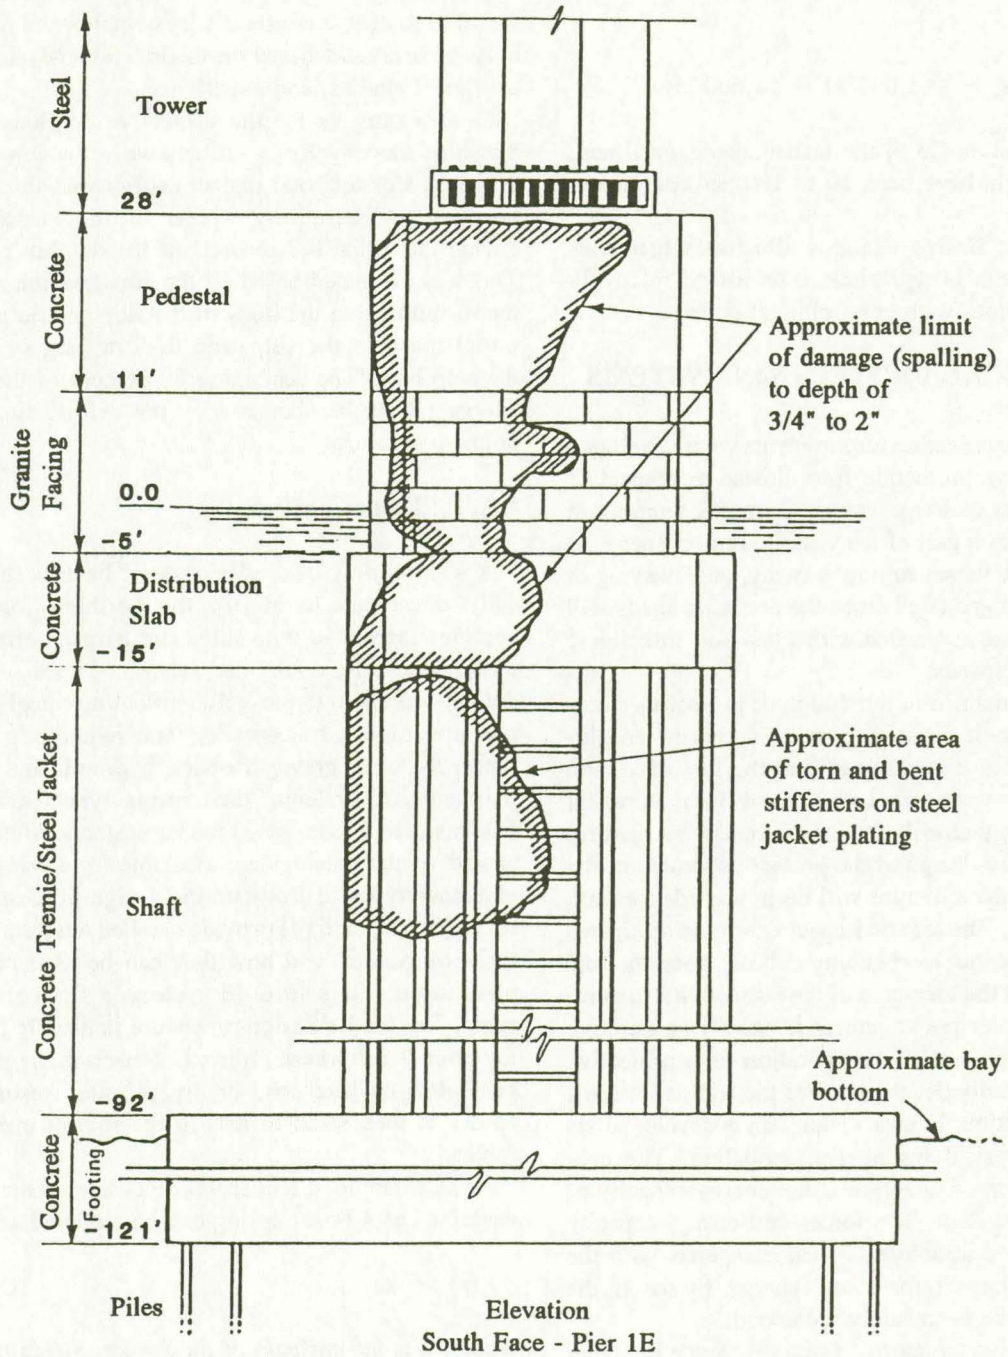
Damage to the Newport Bridge Main Pier After Collision with the M/V Maersk [1].
